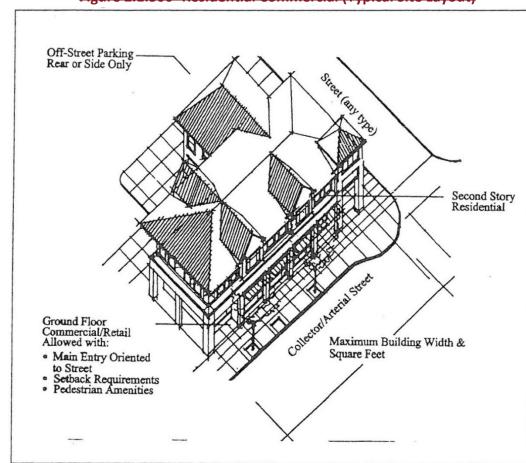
Residential Commercial (Typical Site Layout)
